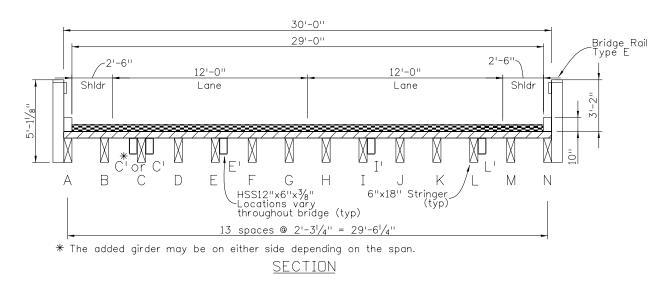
Structure Component Naming Convention for Timber Sister Beams
